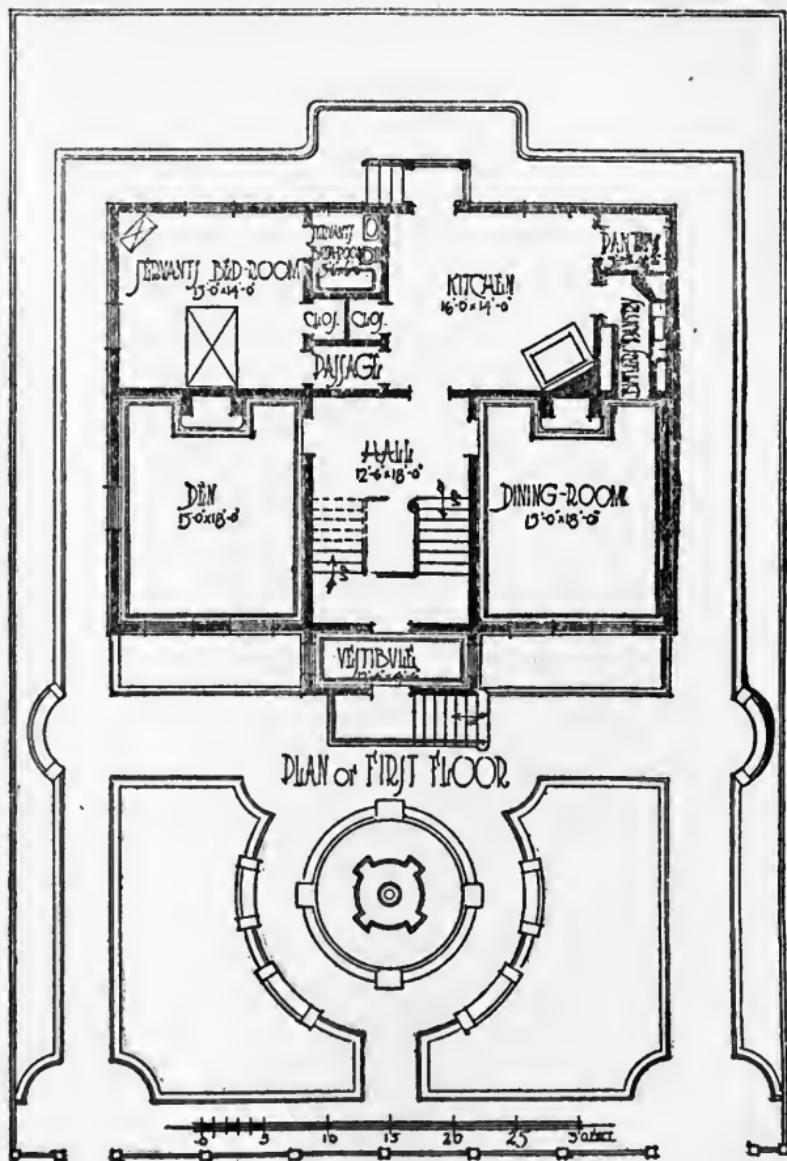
First Floor Plan of an Austrian house. Drawn by W. N. Smith, Architect.
